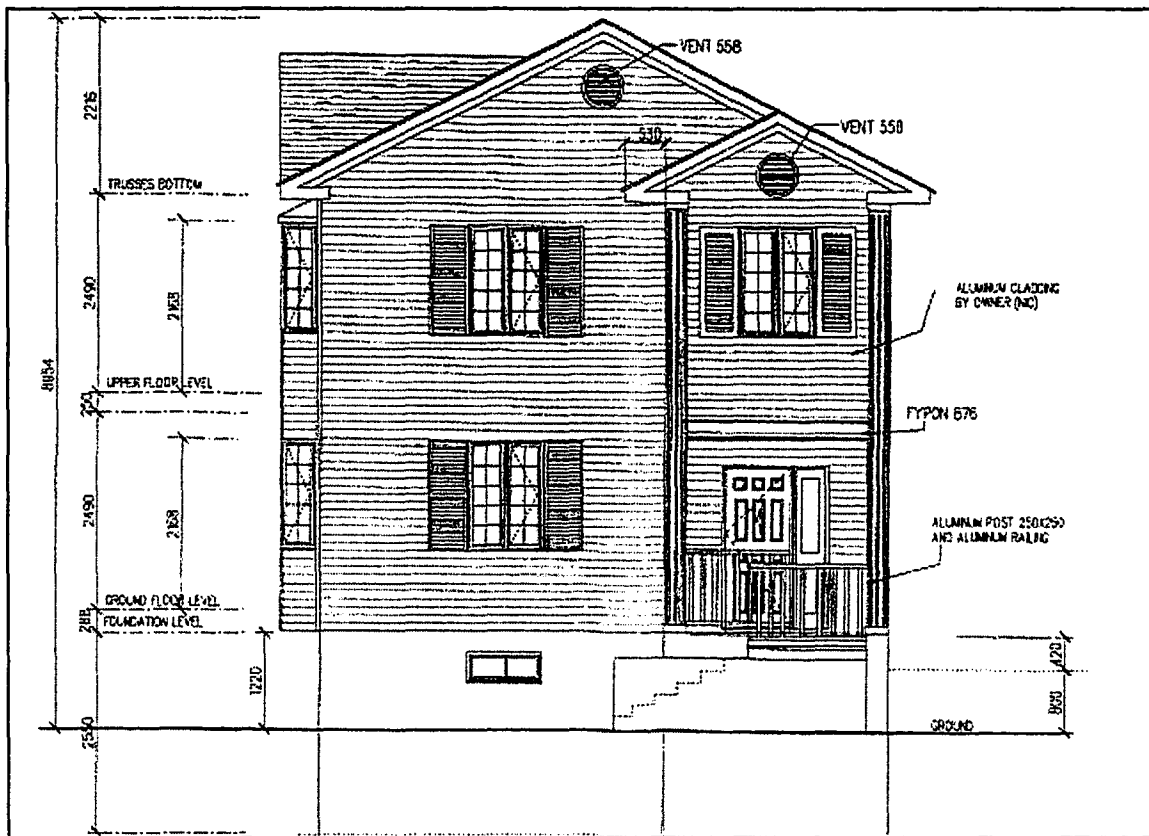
Front elevation of house for Japanese client (Modulex Inc., 1996)
